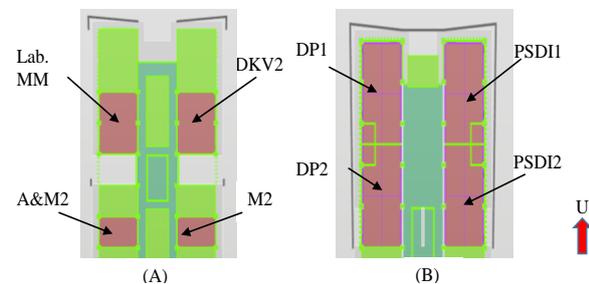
Floor plan of (A) the 6th floor and (B) the 7th floor
